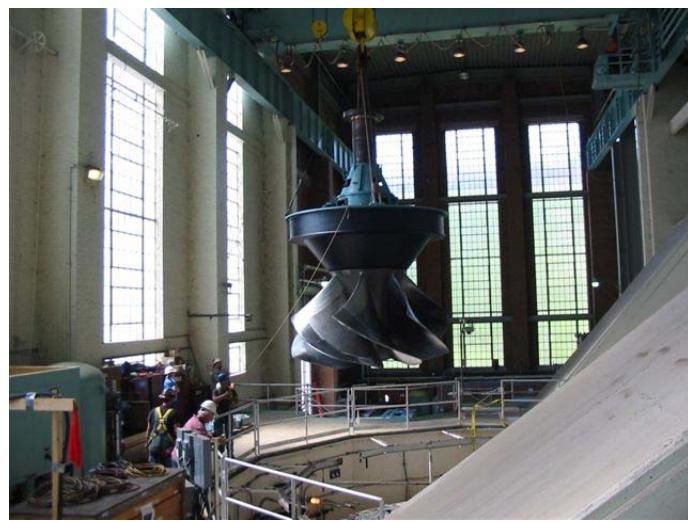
Installation of Turbine, Inner Head Cover, and Bearing Housing
